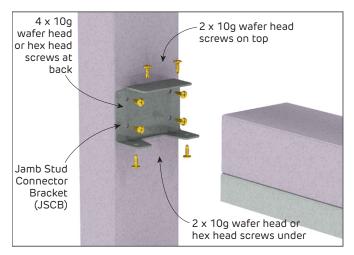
Header to Jamb Stud Connection for Prefabricated Door Frames Elevation
